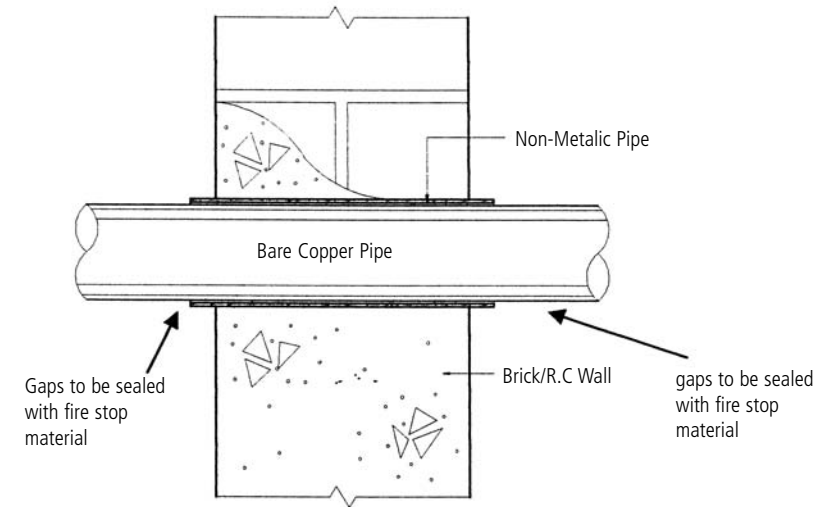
PIPE PENETRATING THROUGH SOLID WALL OR FLOOR
